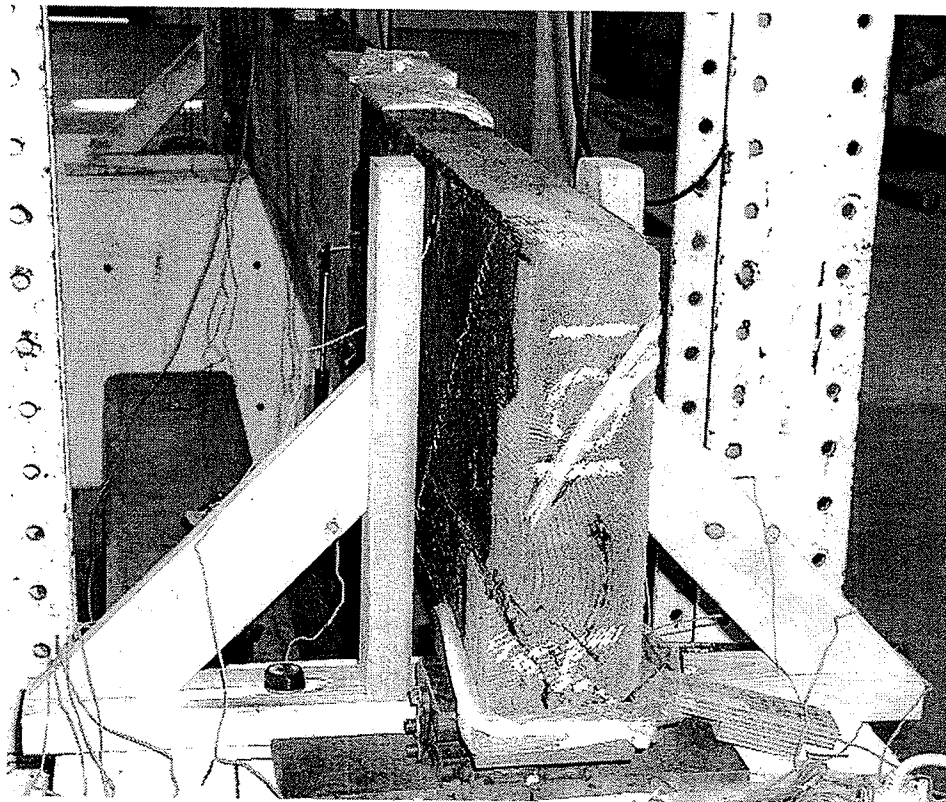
Example of bearing failure at the support on C2A (Y2-101A)
